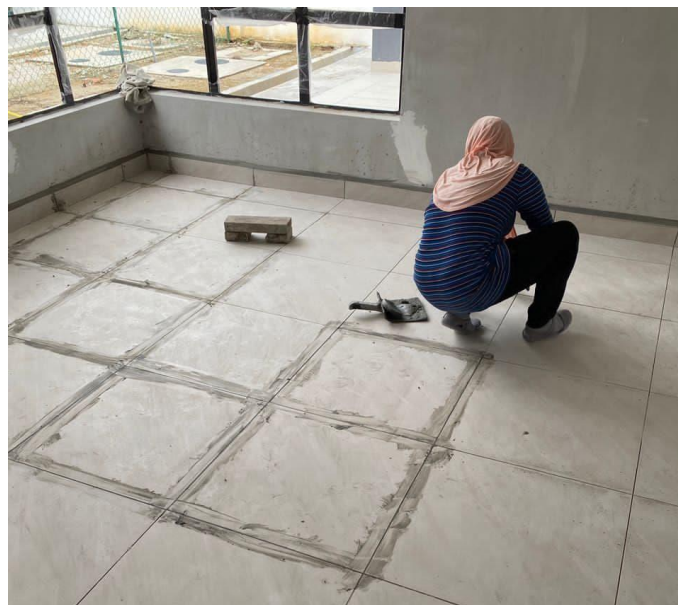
Finished Product of Installed Tiles for Master Bathroom
